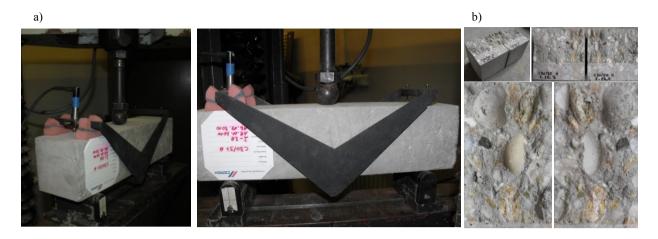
a) Selected specimen tested in three-point bending configuration and b) the fracture parts/surfaces after test [photo: B. Kucharczyková].
